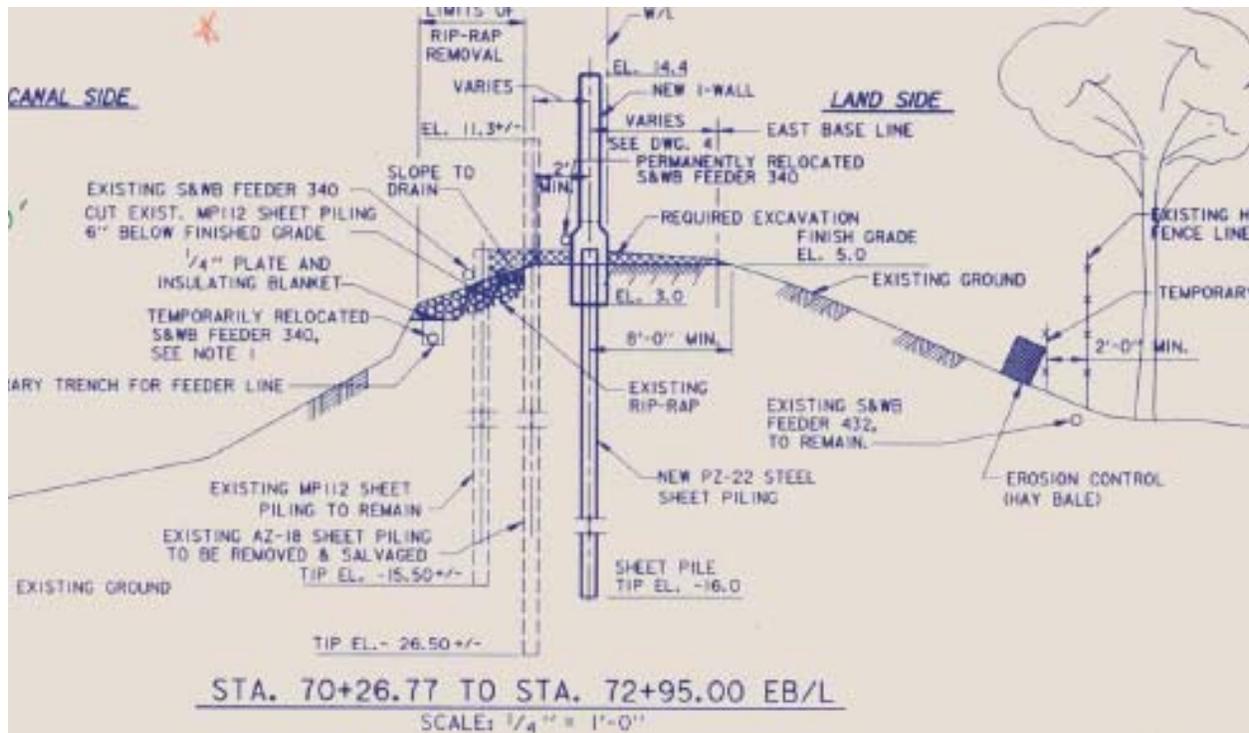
Typical section of floodwall with 14.4 ft design elevation on London Avenue I-wall.
